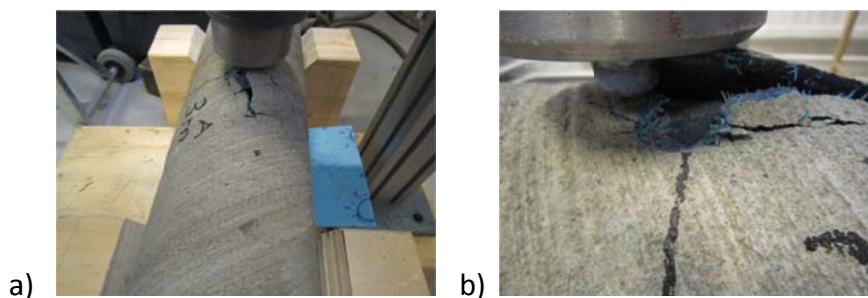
3.A specimen after impact. a) wide external view b) close external view.
